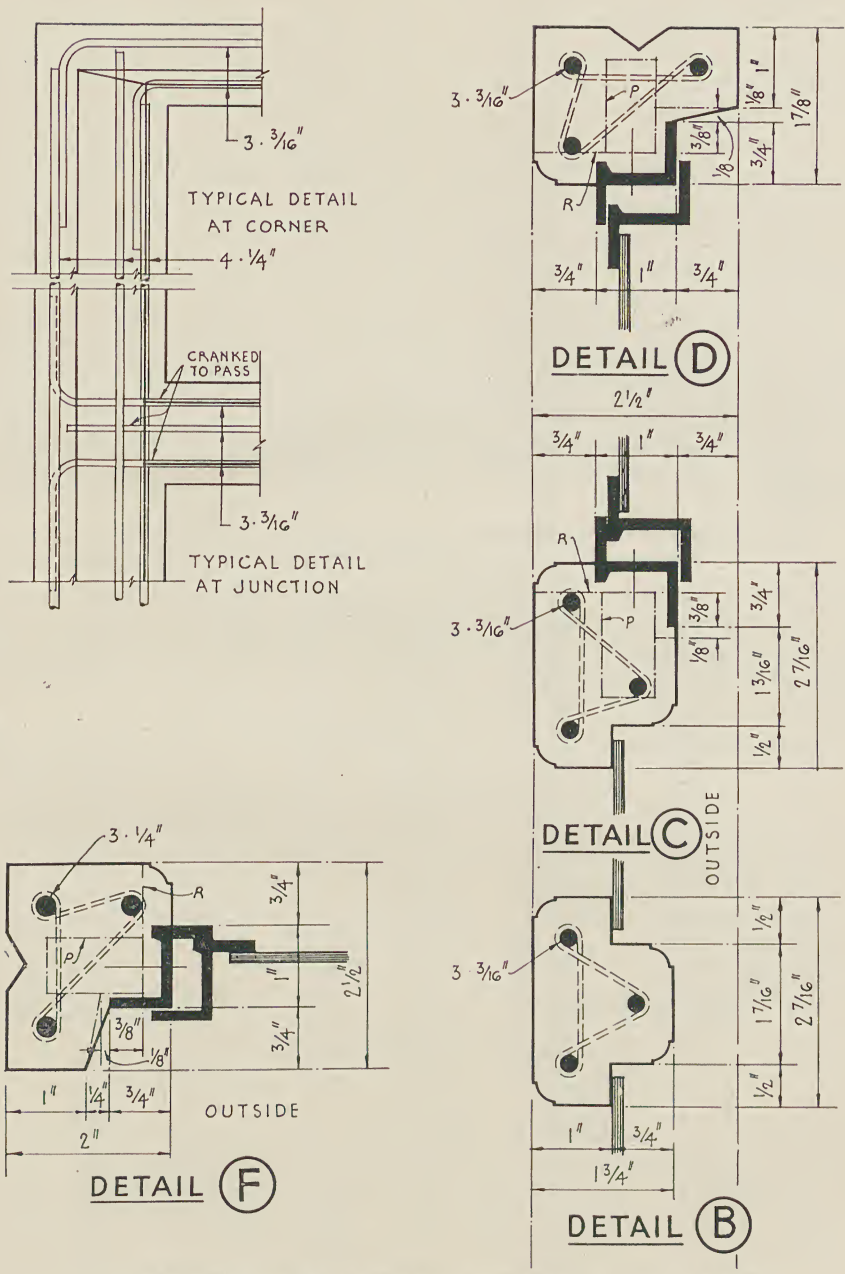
SECTIONS OF MEMBERS OF CONCRETE WINDOW FRAMES.
